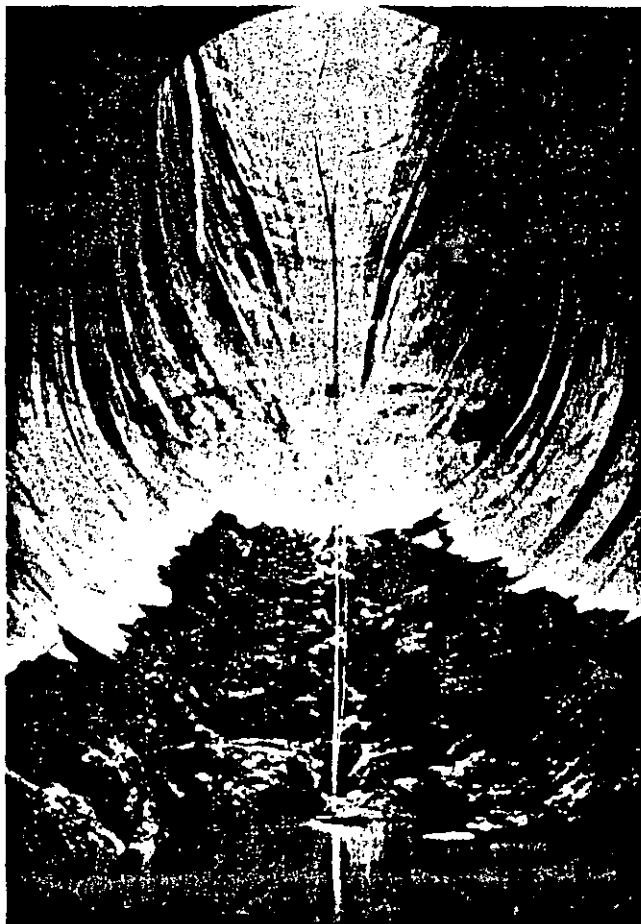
Eroded area in spillway tunnel at Hoover Dam, 500 ft below crest, before repair with PA concrete
